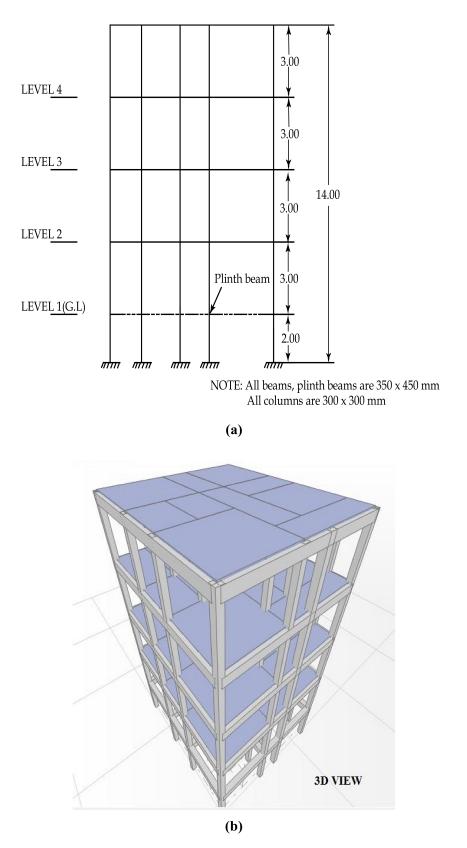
(a) Cross-sectional elevation of building with beams and column size, (b) SAP2000 three dimensional (3D) model.
